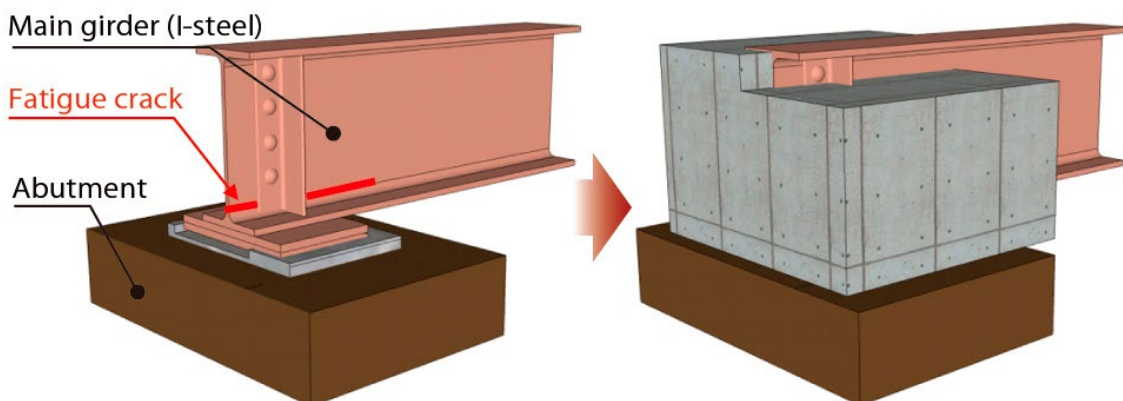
Concrete jacketing method for short span steel girder supports
